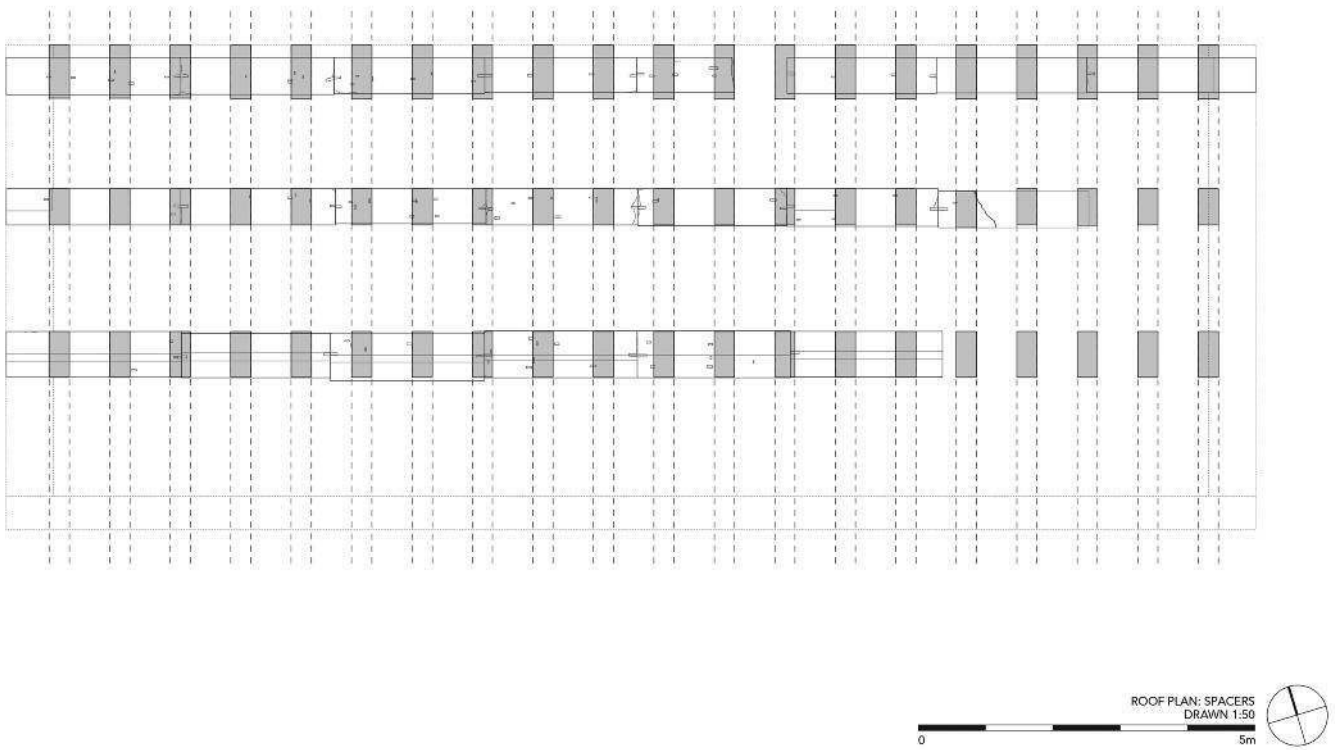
Schematic plan of HF roof, showing placement of spacers (shaded) on architraves and between pan tiles (BULP).
